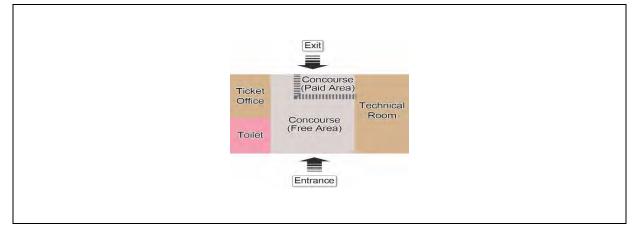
Prototype Station Building Plan of At Grade Type Small Station
